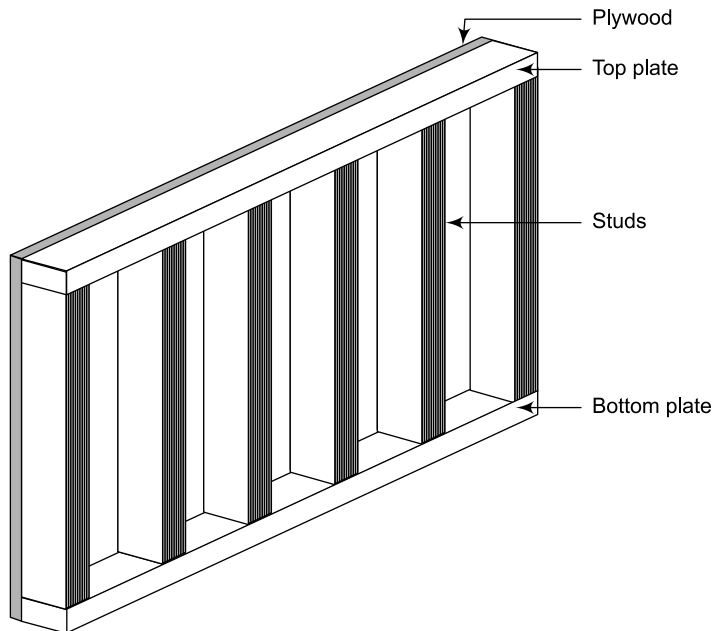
View of a Typical Shutter Panel Made up of Timber and Plywood.
